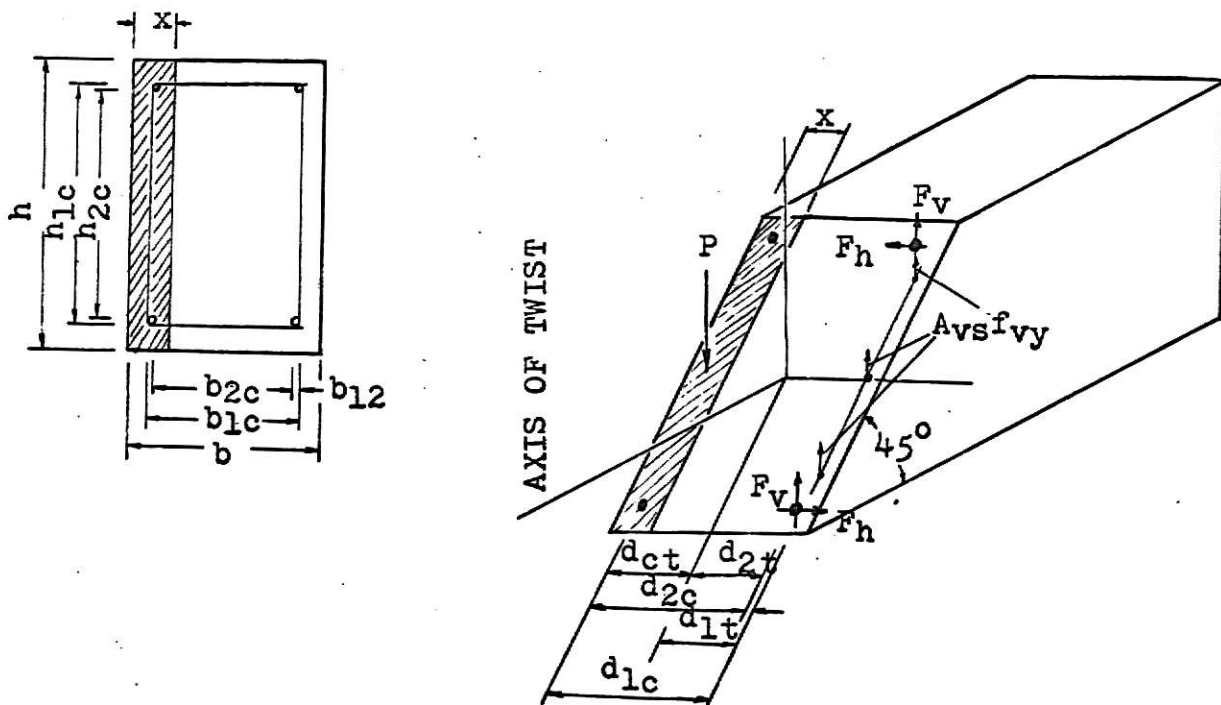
FAILURE SURFACE AND CROSS SECTION
